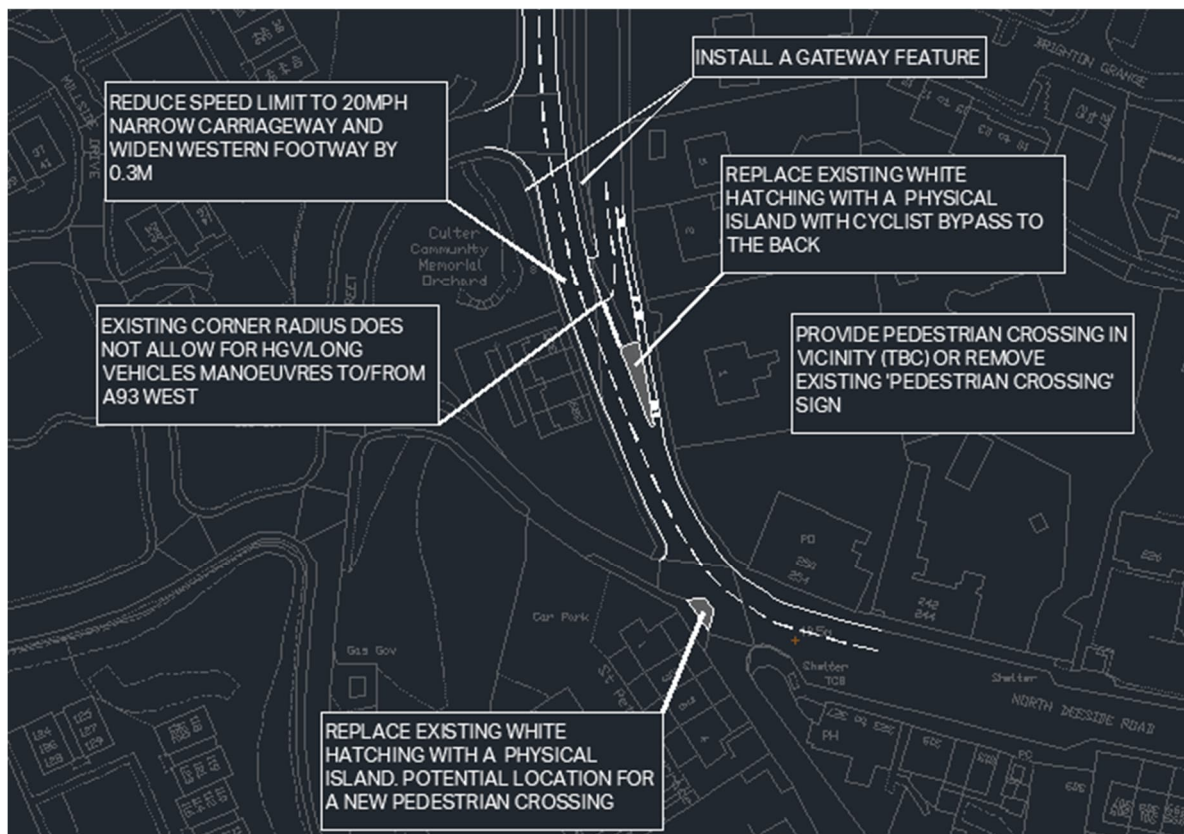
A93/Malcolm Road Junction - Proposed Layout
